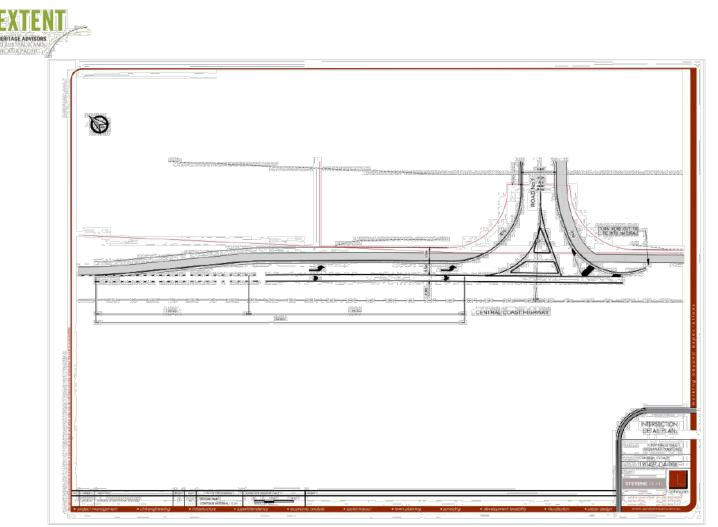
The Intersection Detail Plan showing the Exit-Lane into the HCP from the Central Coast Highway (source: ADW Johnson, Intersection Detail Plan, Drawing No.190427-DA-006).
